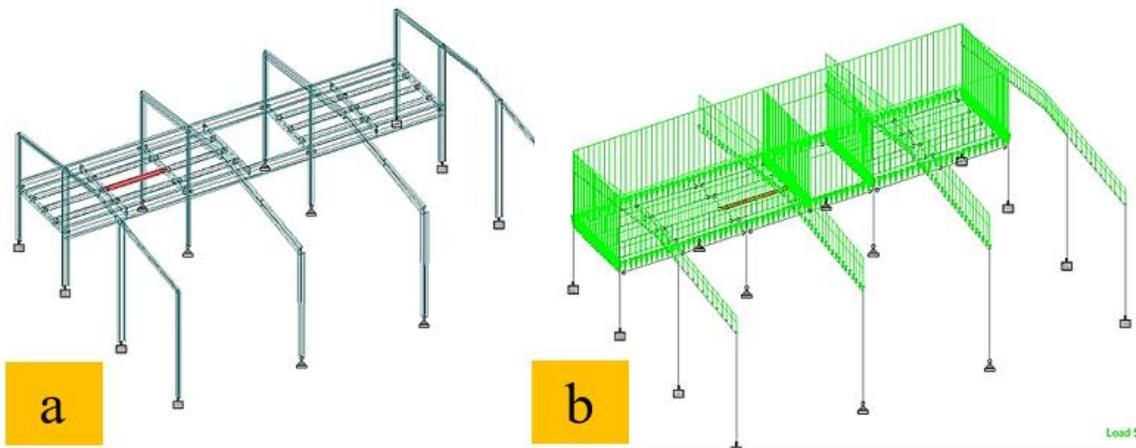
(a) Dimensions & Geometric properties of a Cold formed steel sections; (b) graphical output representation of cold formed steel section
